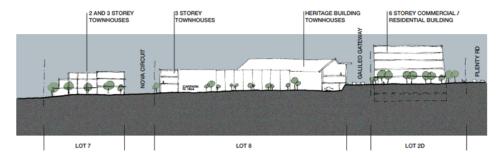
Indicative north-east to South-west Section: Plenty Road to Sanctuary Drive
